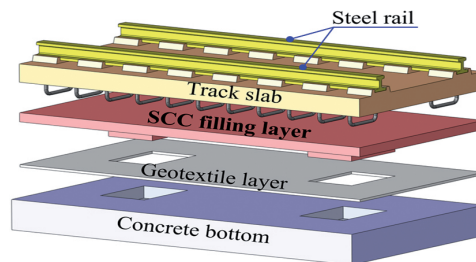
The structure section and layout of CRTS III slab ballastless track [10]
